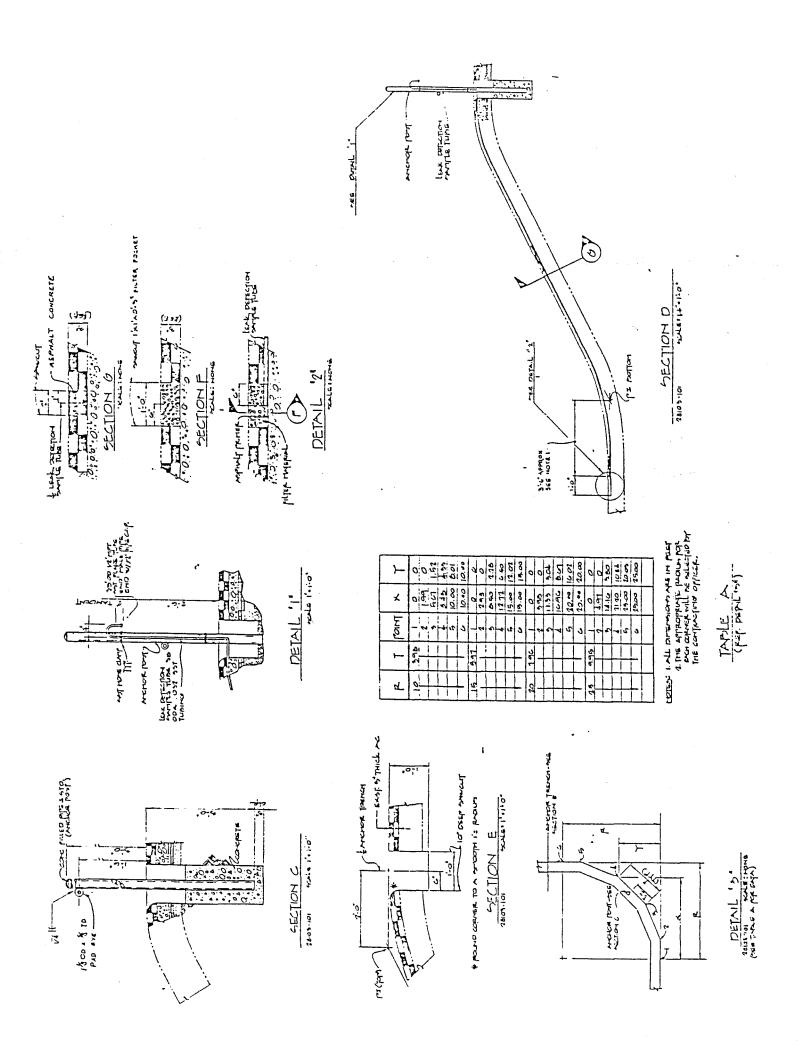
Pond 207-B South 1977 Membrane Pond Liner Plan
